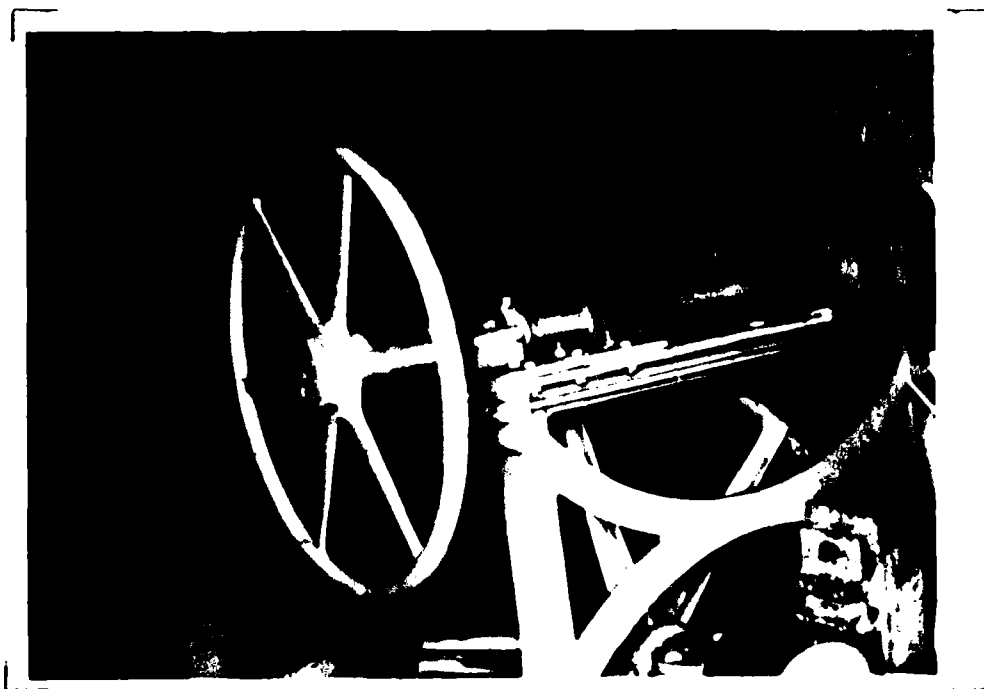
Interior of right gatehouse and gate hoist mechanism. Note belt driven alternate gate hoist system.
